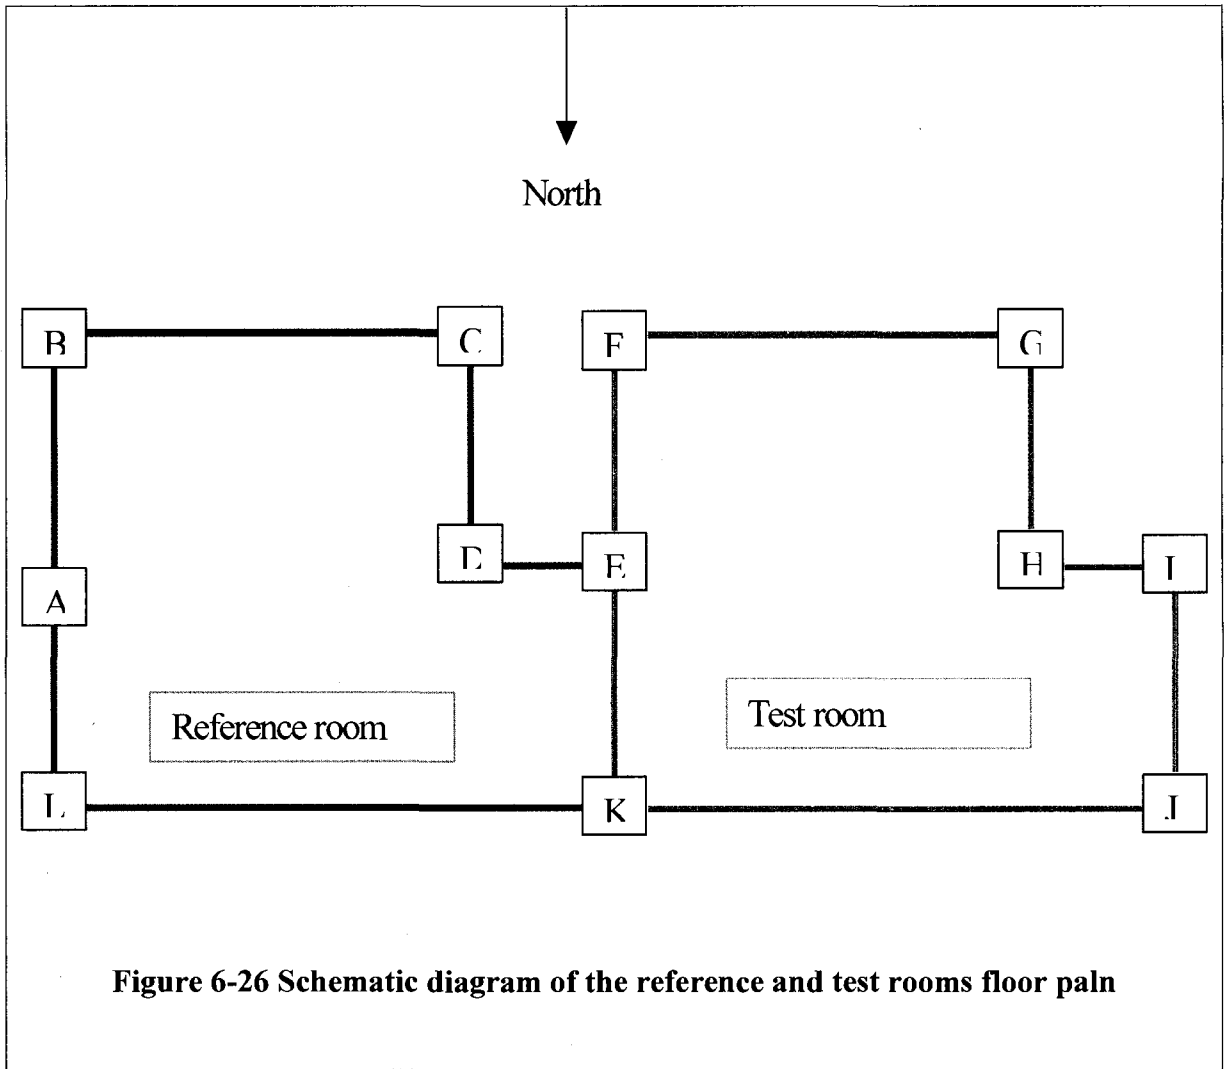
Schematic diagram of the reference and test rooms floor plan
